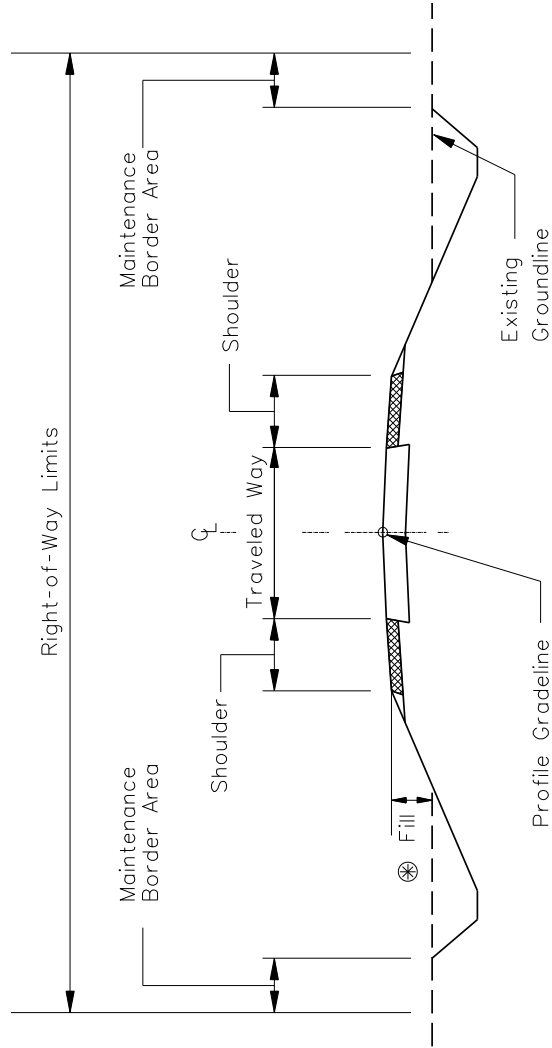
A and 47-2.B illustrate typical schematic cross sections for two-lane highways. The tables in Section 47-2.06 provide the minimum criteria for lane widths, shoulder widths, and other cross section elements that should be used on rural two-lane highways.
